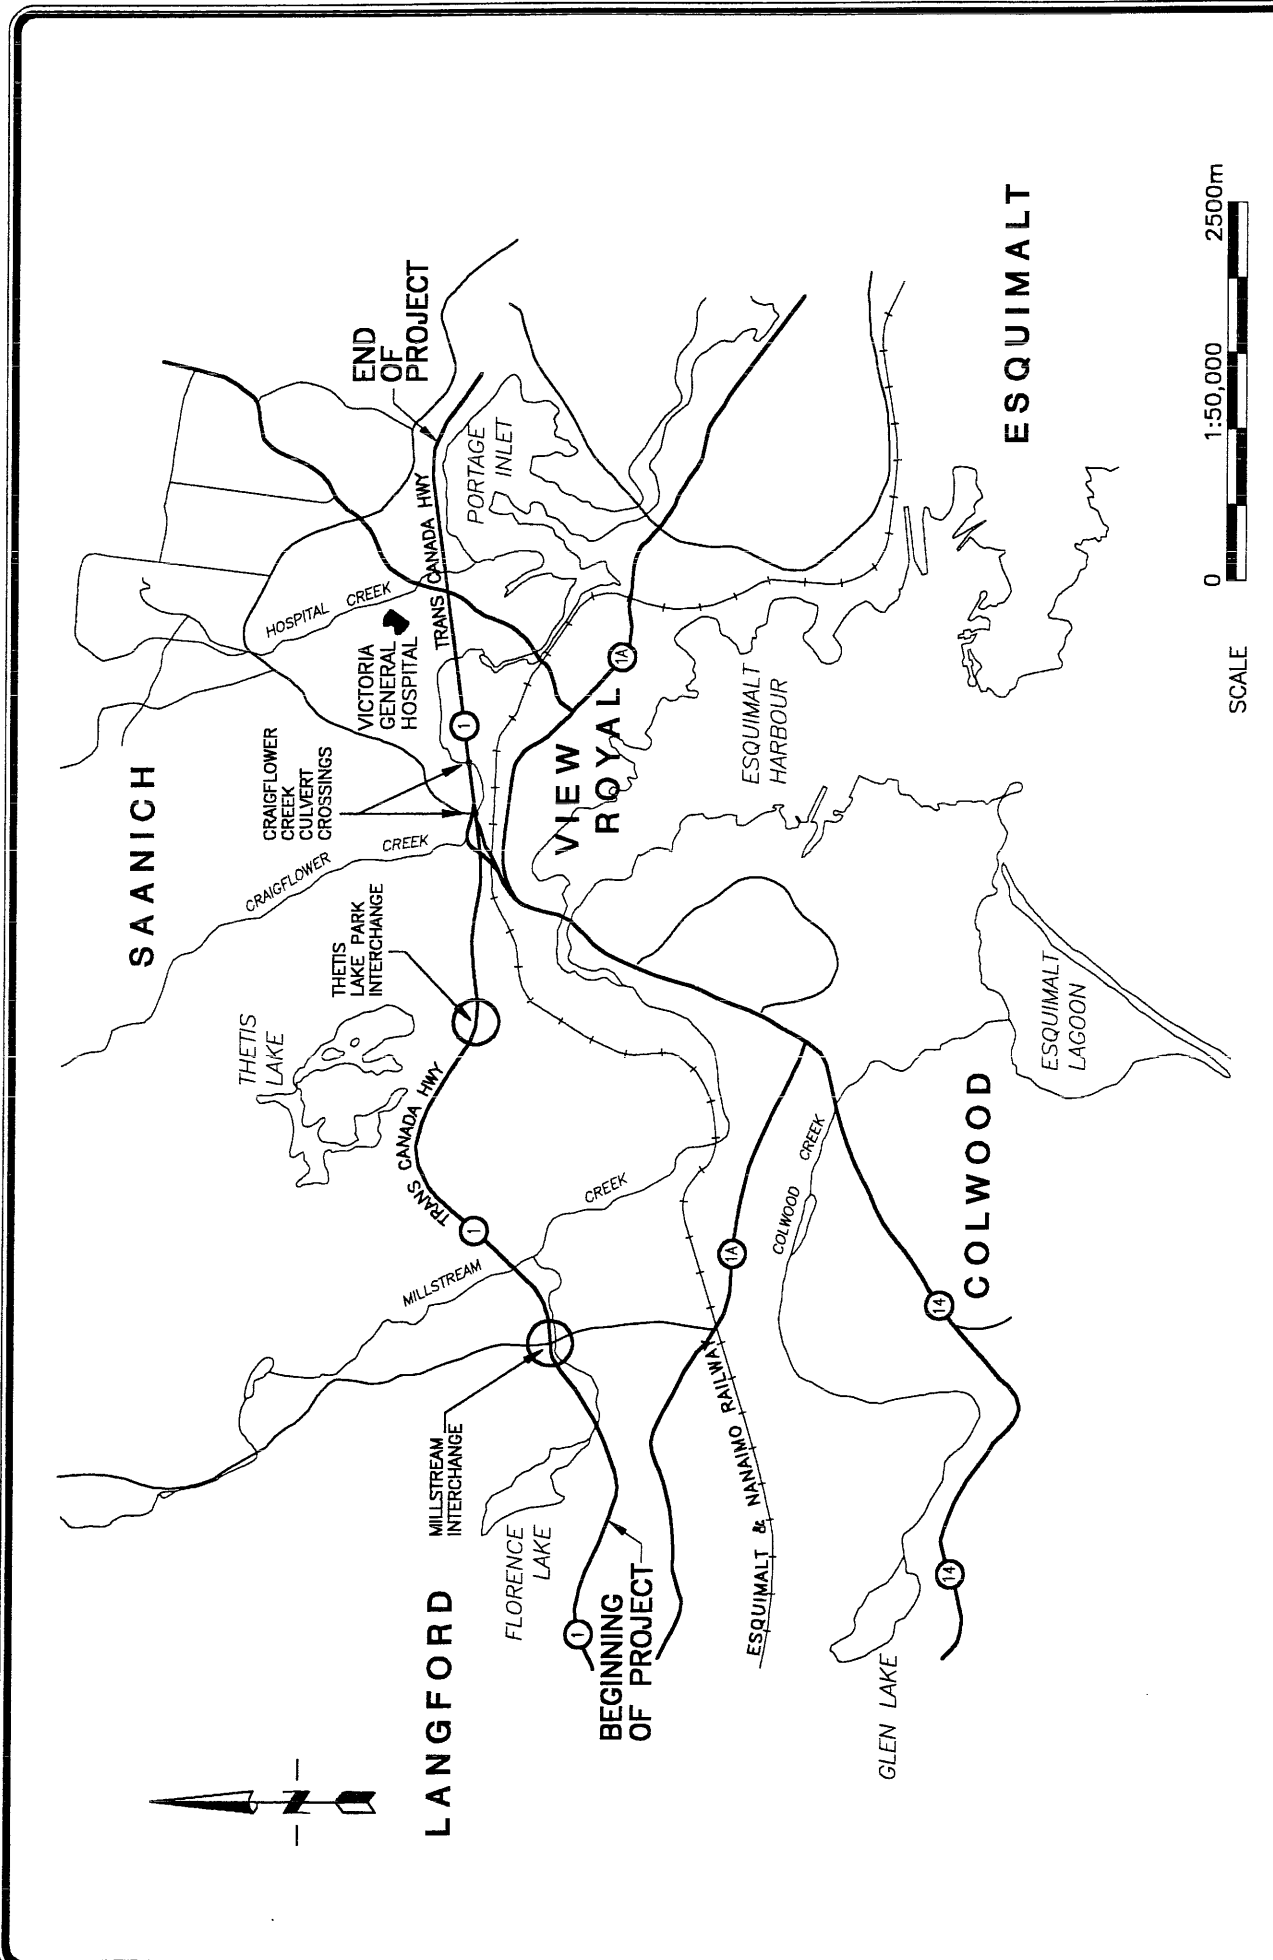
Trans Canada Highway – Victoria Approaches Location Plan
